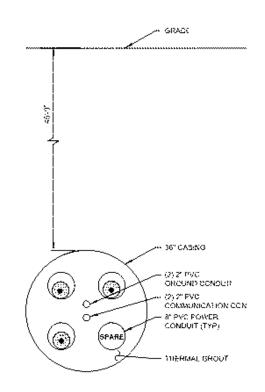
Typical 161 kV HDD at River Crossing and Refuge Cross Section
